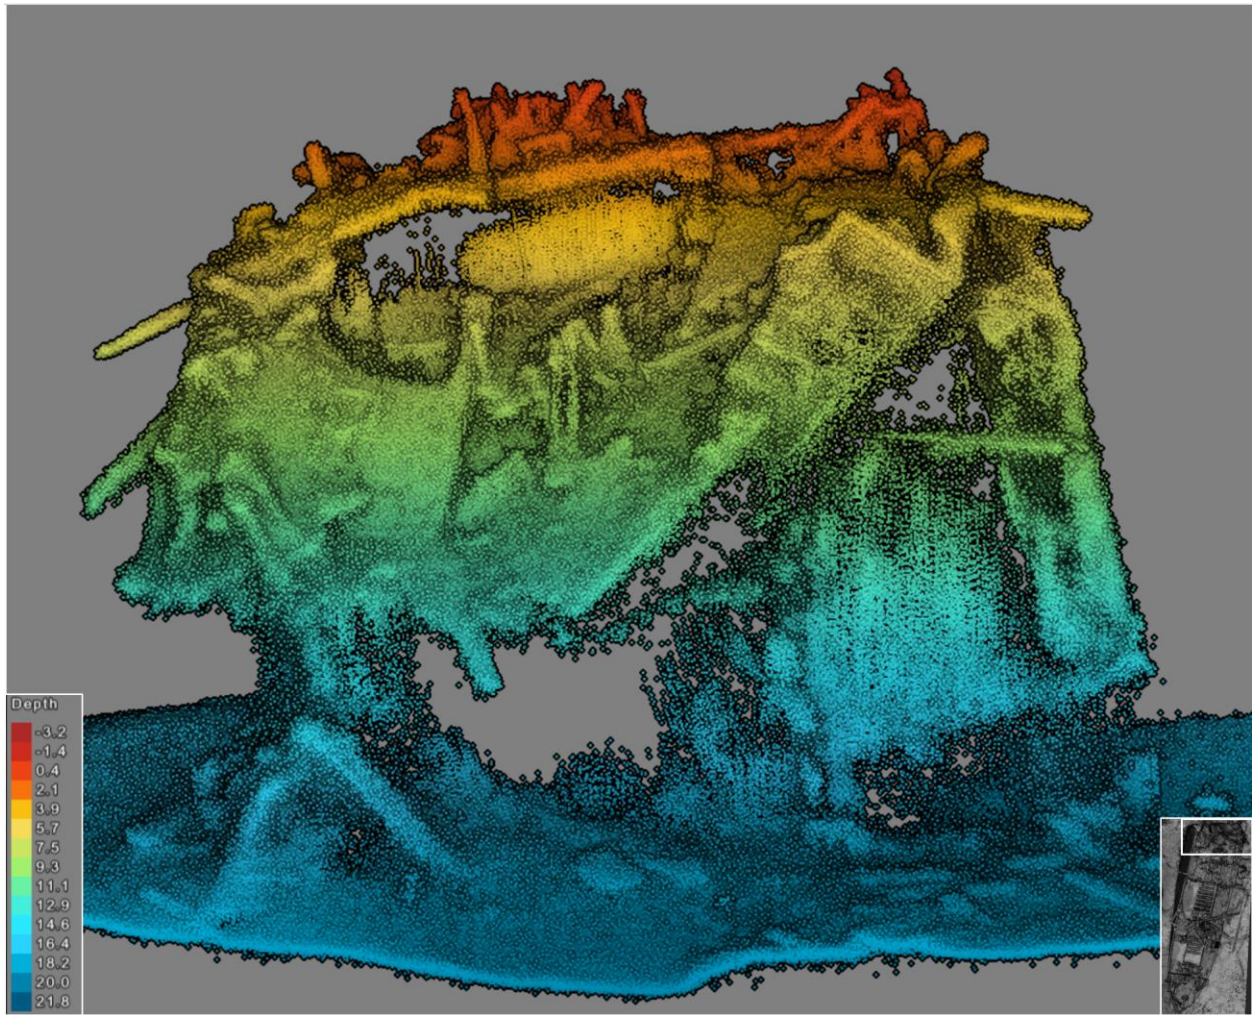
Point cloud image of the collapsing bridge area, key area 6.
